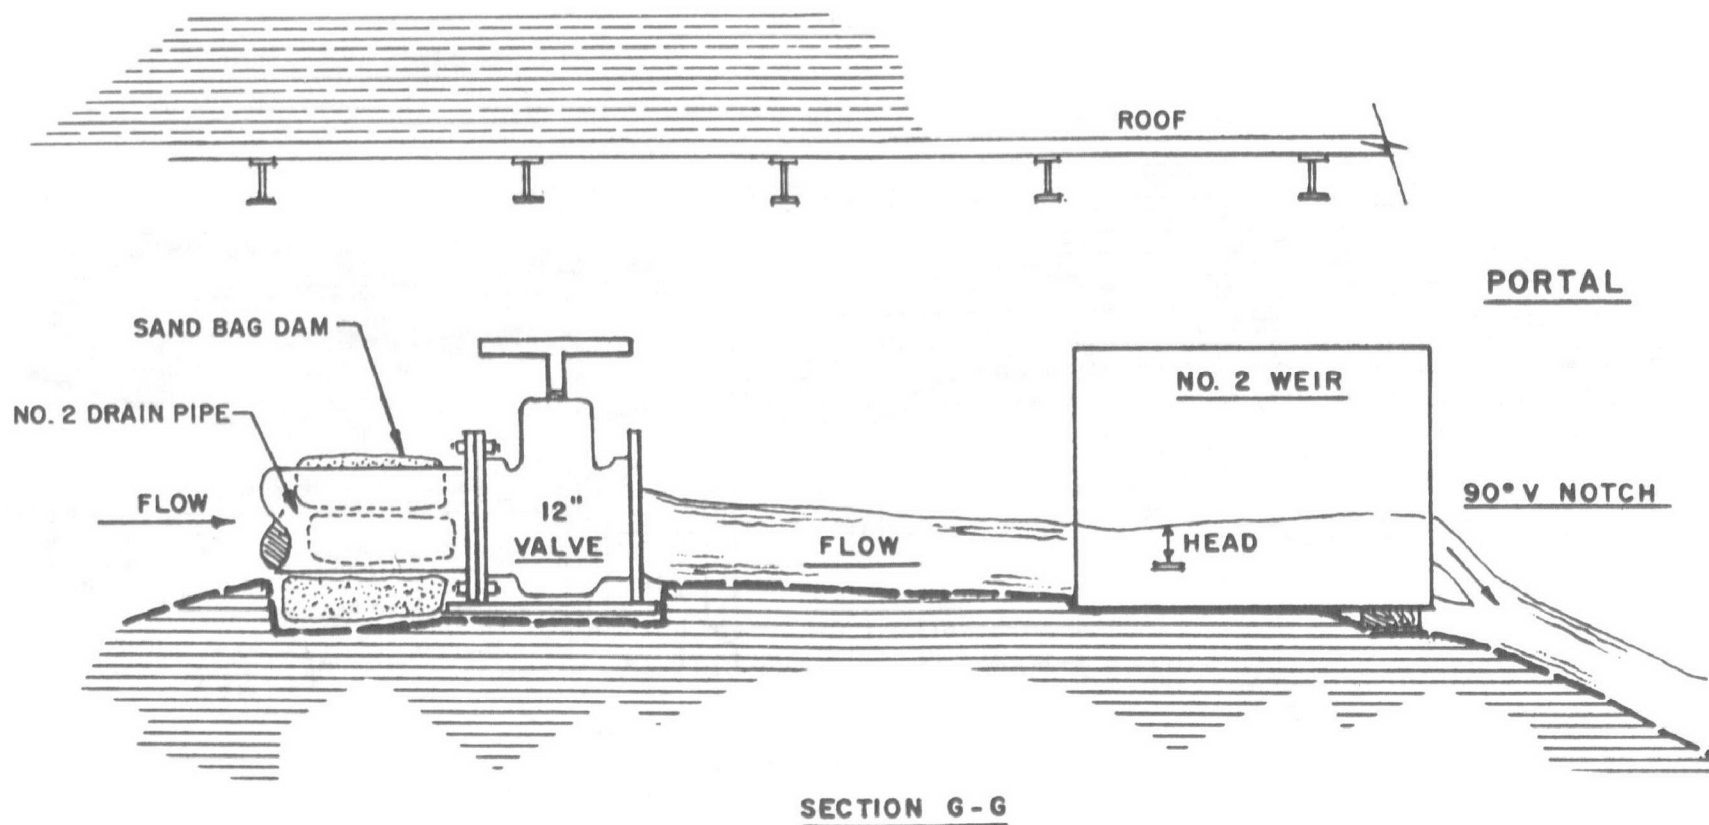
Section Through No. 2 Drain Pipe and Weir
